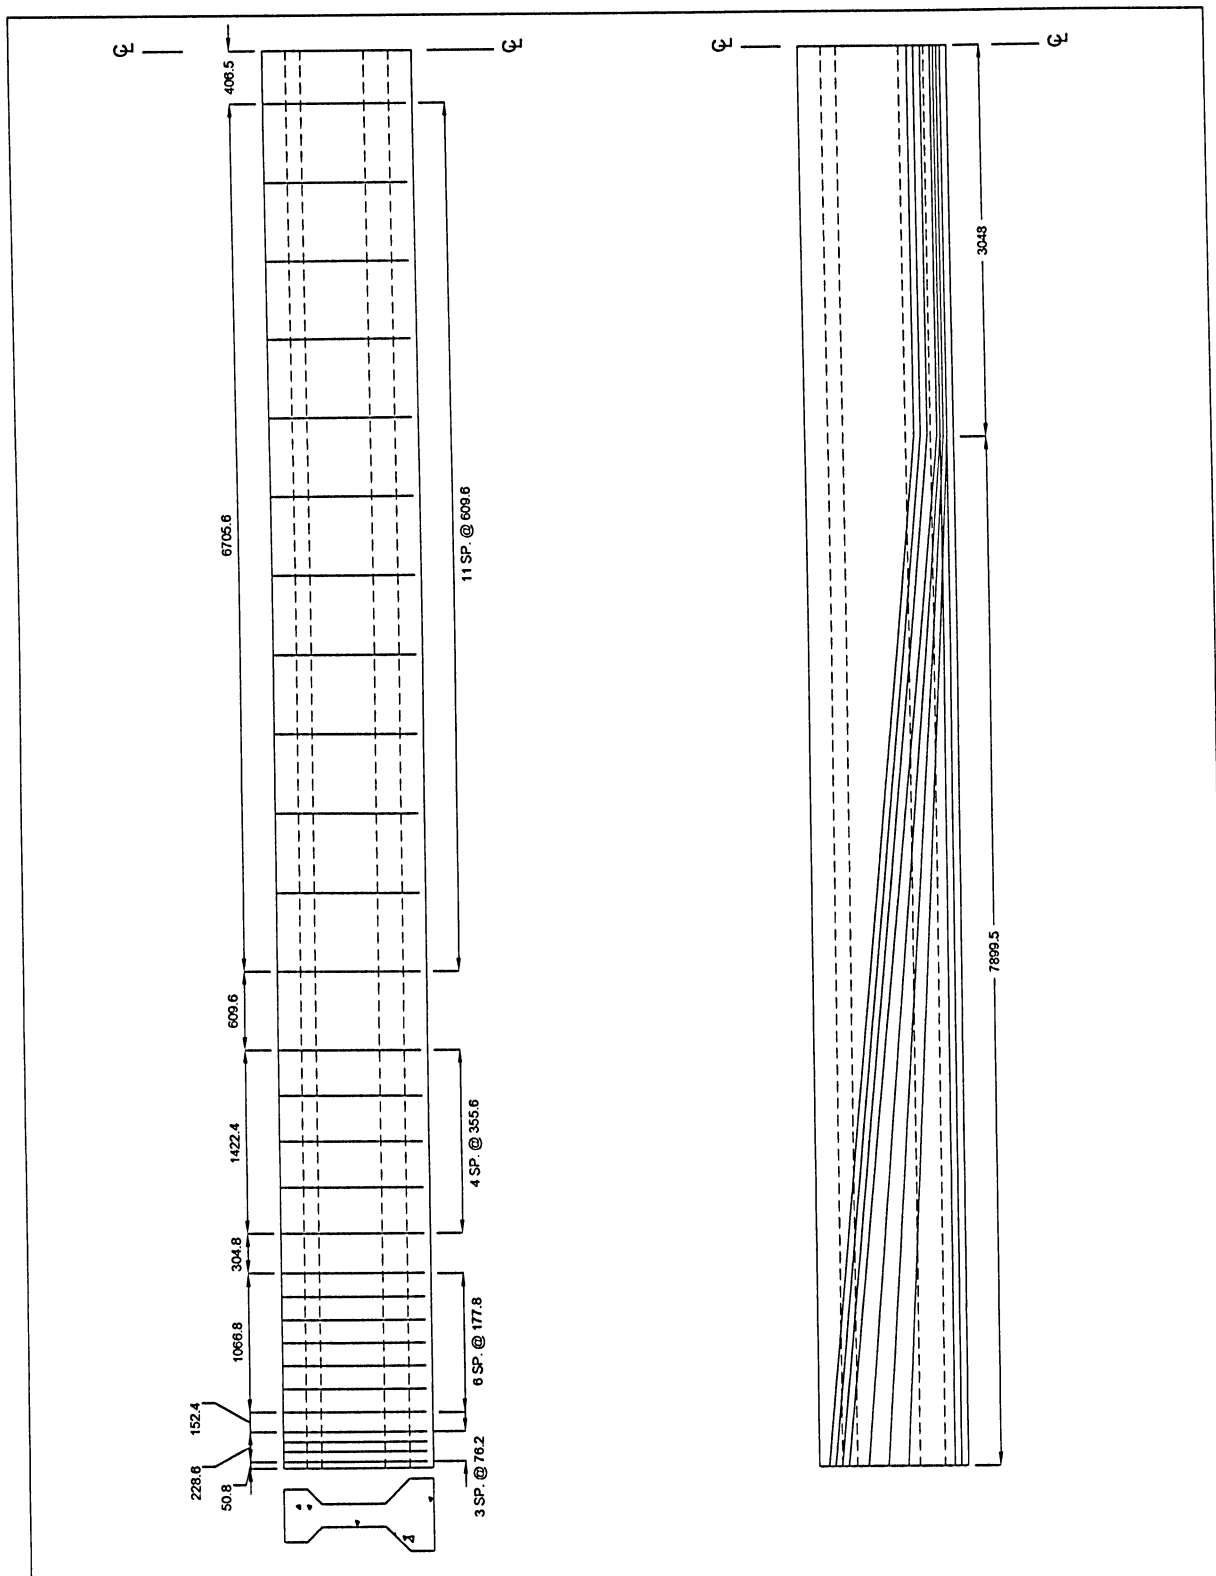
AASHTO Type III girder longitudinal section details for stirrups (top), and tendons (bottom)
